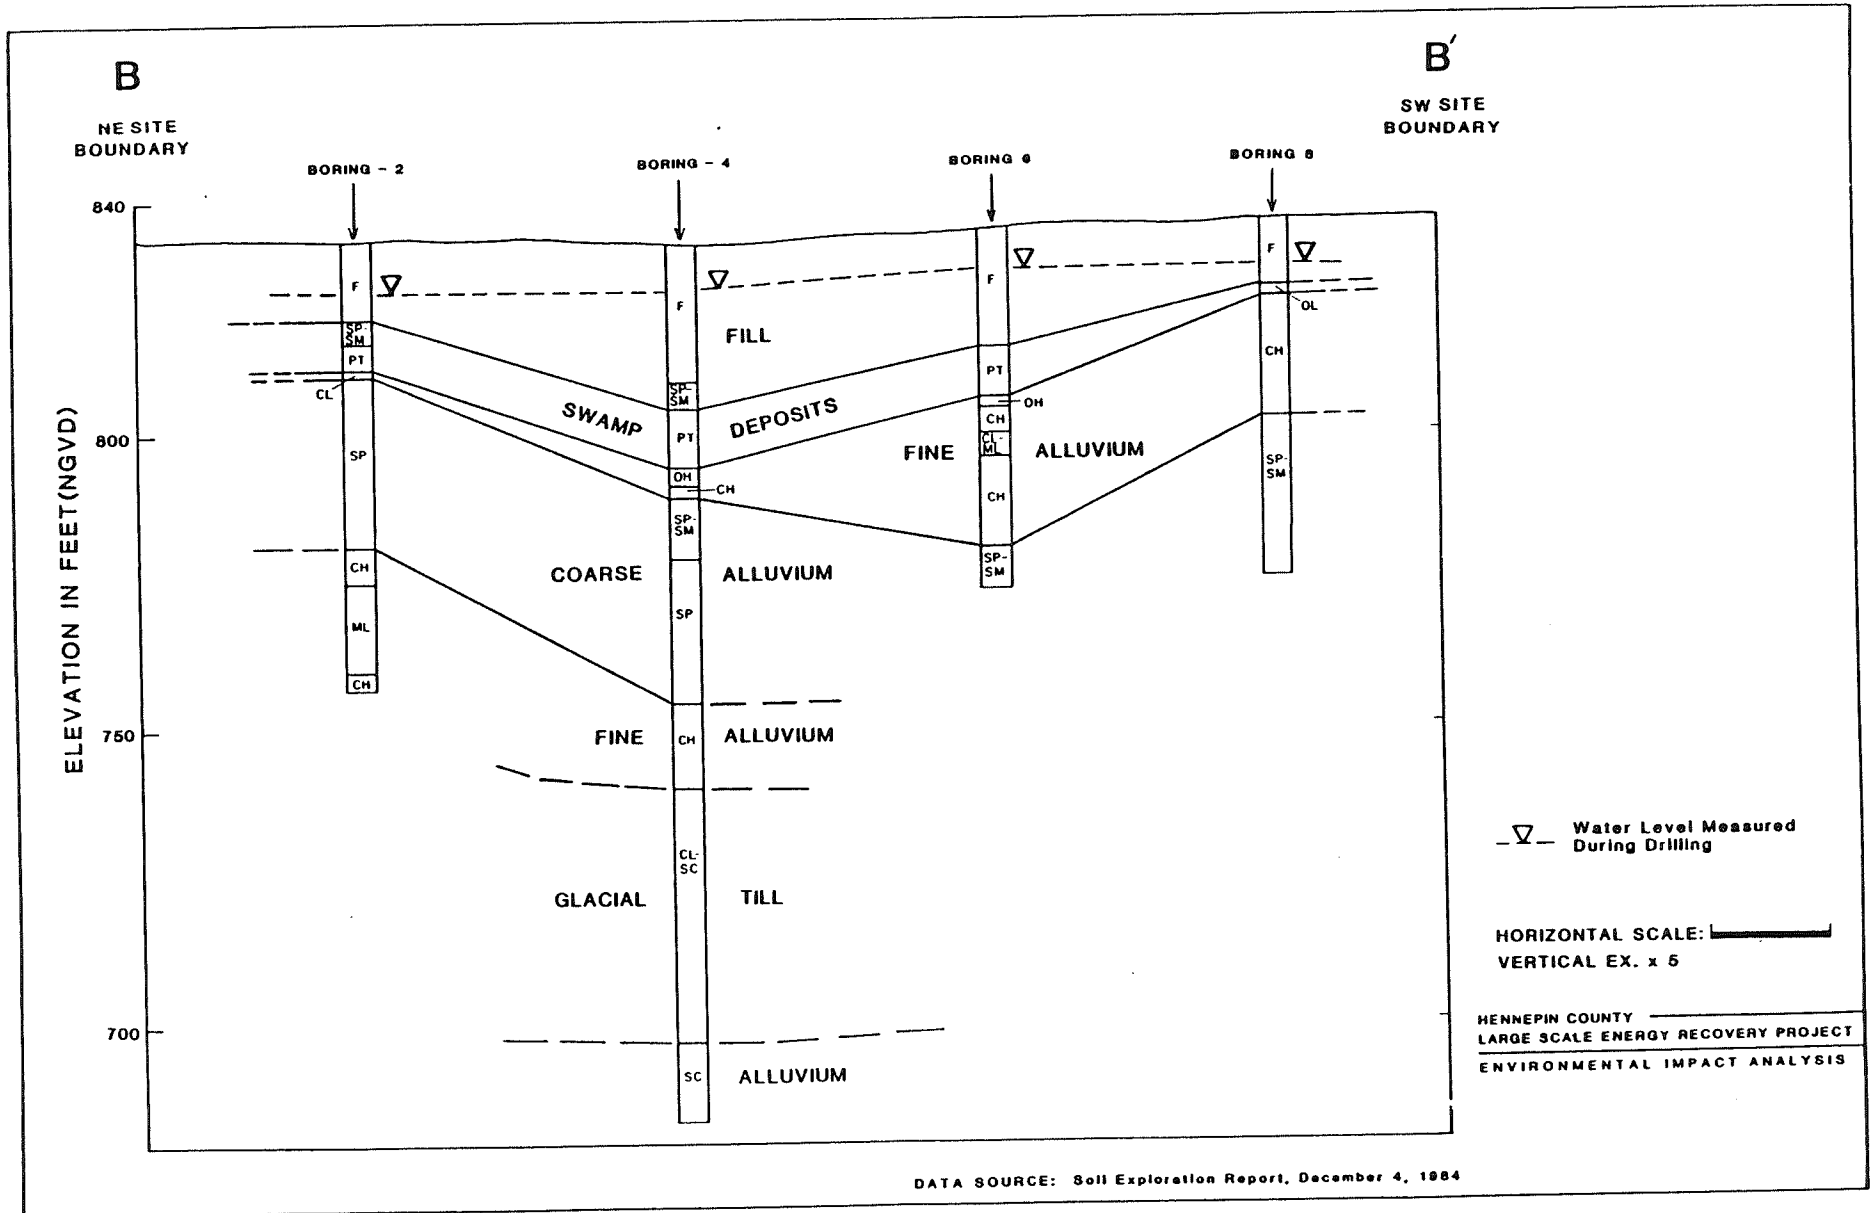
Soils Cross-Section B-B': Greyhound Site
